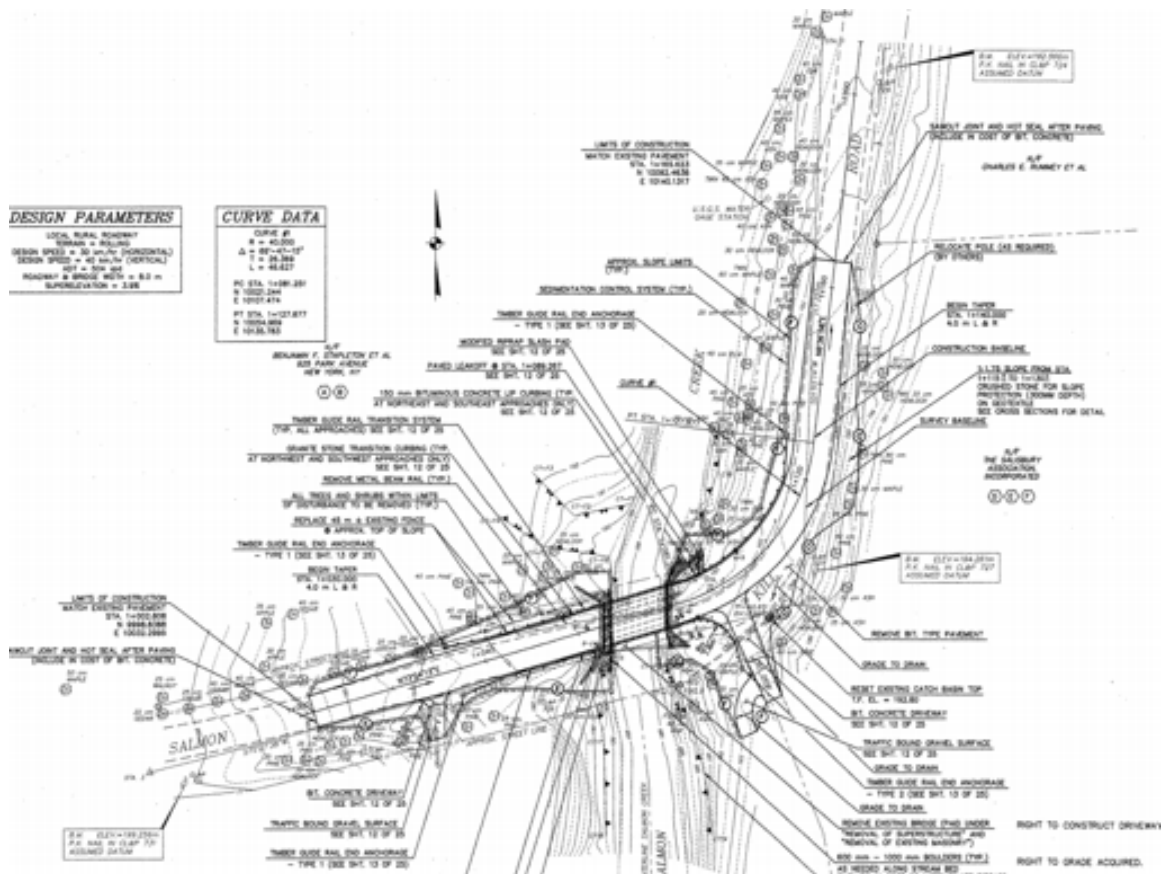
Detail from the 2000 project plans for the construction of Bridge #05200 (State Project #121-126) showing the limits and character of work involved with construction.
